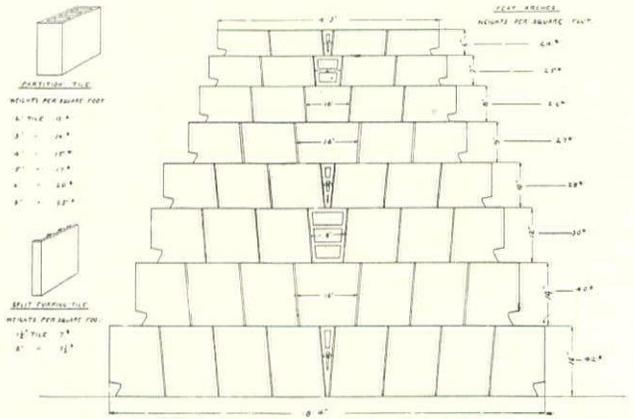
ELEVATIONS OF (HOBART) NAT'L FIREPROOFING CO.'S POROUS TERRA-COTTA END-PRESSURE FLAT ARCHES.
